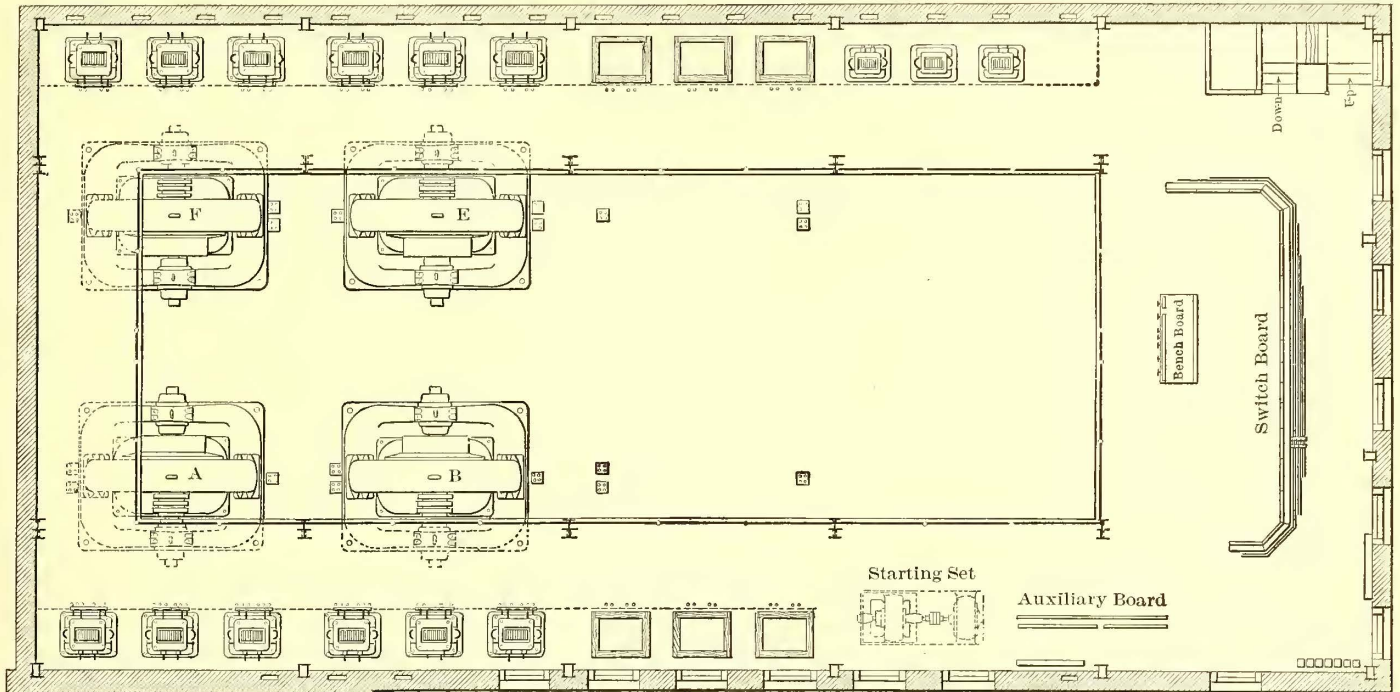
PLAN OF SUB-STATION NO. 4, LOOKING DOWN ON TRANSFORMER GALLERY AND MAIN FLOOR
